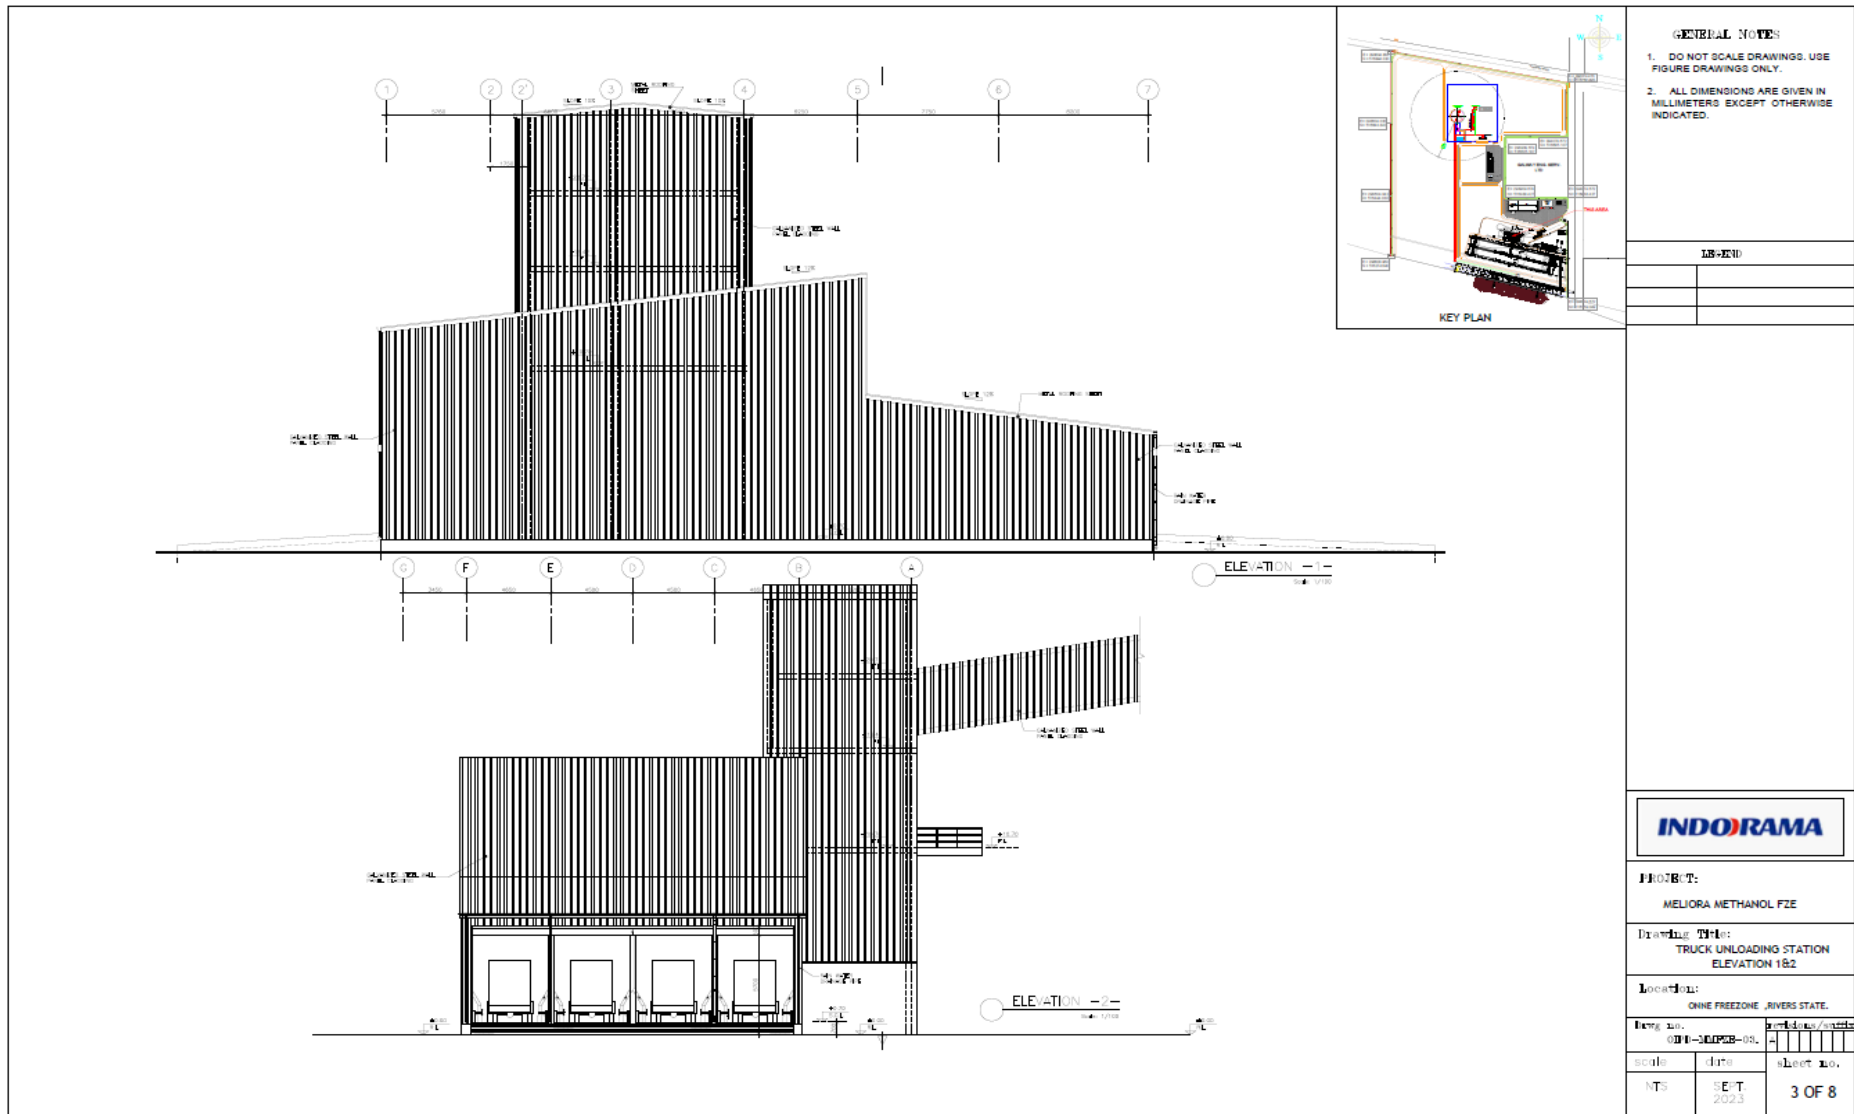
Truck Unloading Station Elevation 1 and 2
